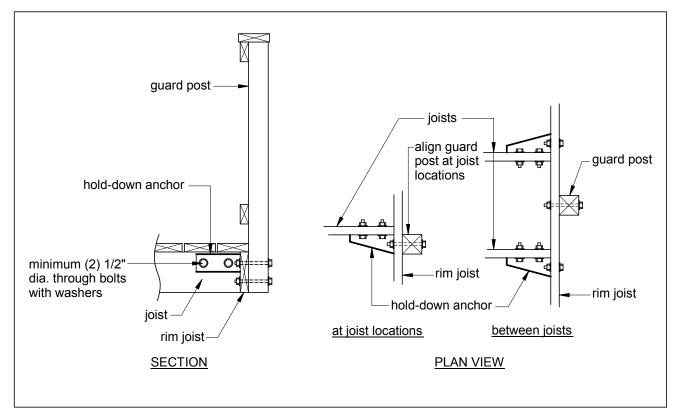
GUARD POST TO RIM JOIST DETAIL
